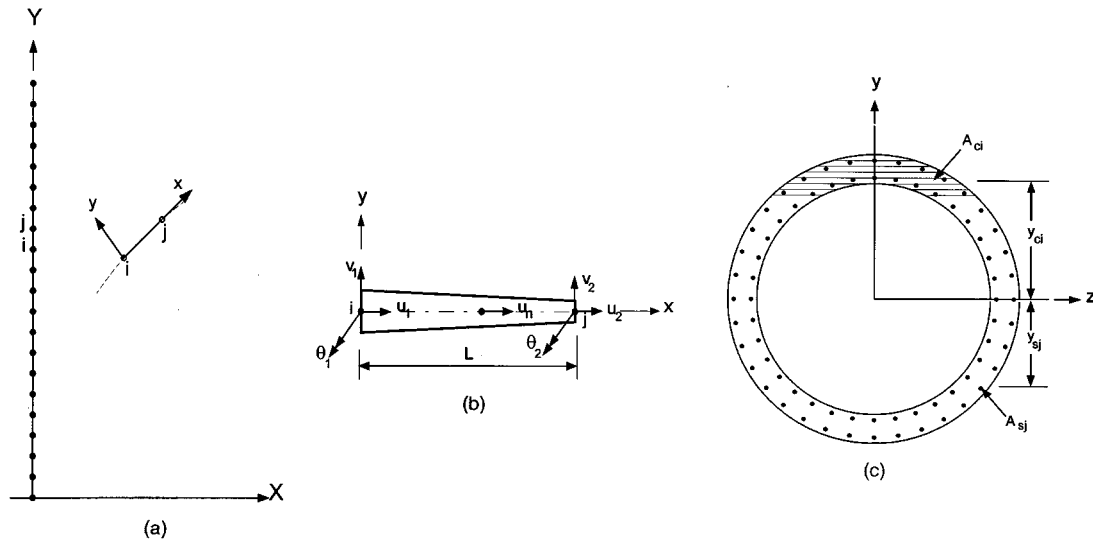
Finite element model of stack-like structure: (a) idealized stack; (b) beam element; (c) idealization of cross-section
